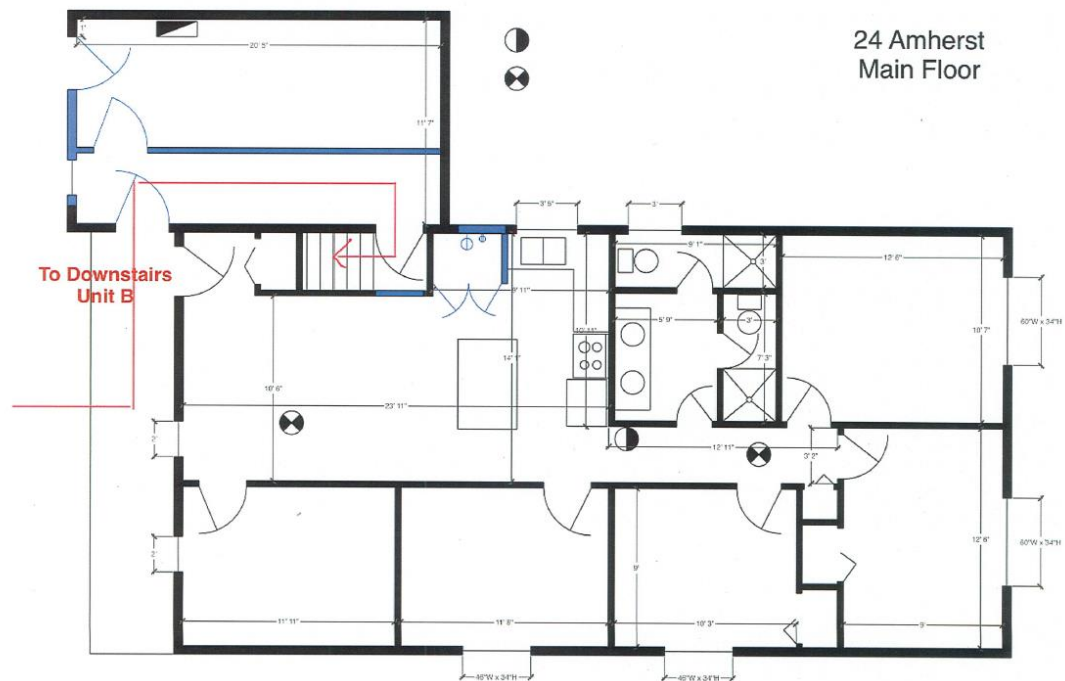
Floor Plan showing proposed new entrance and garage conversion.
